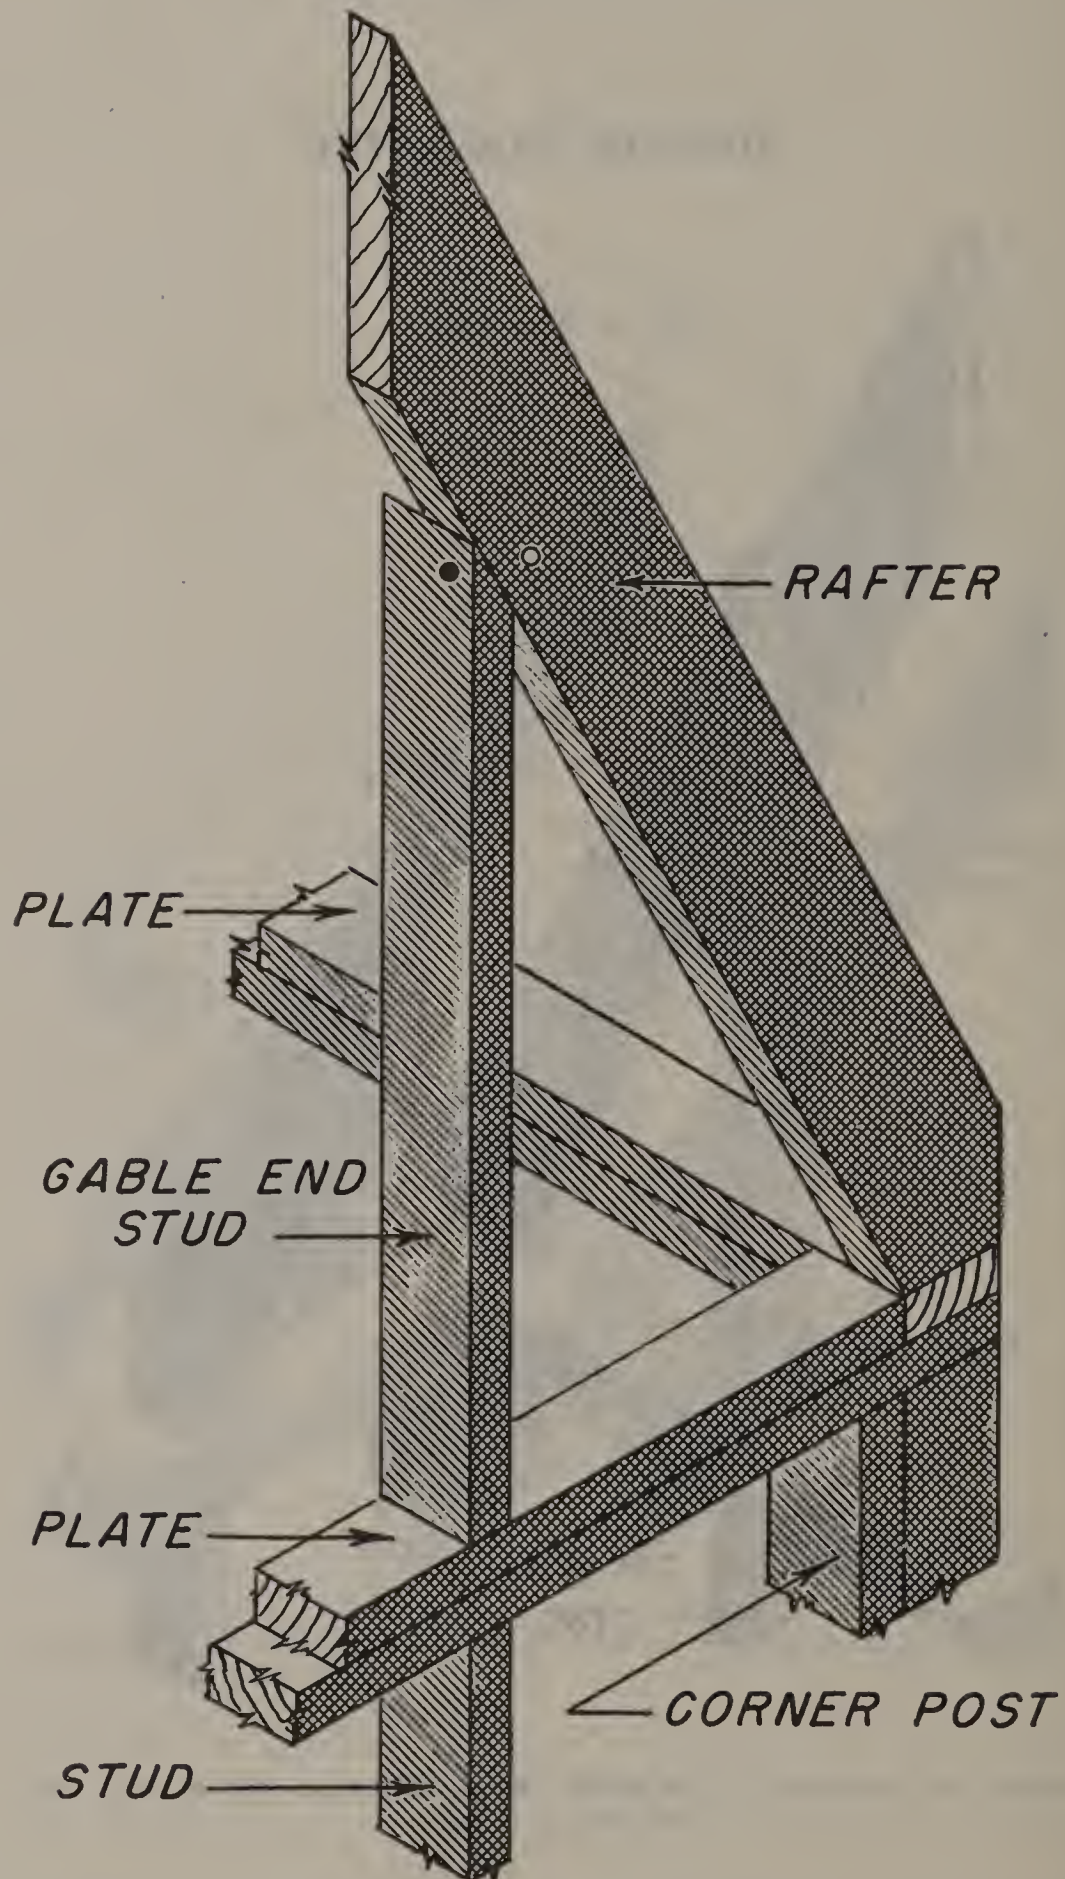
Beveled gable stud. Rafter toenailed to stud and stud nailed to rafter with tenpenny nails.
